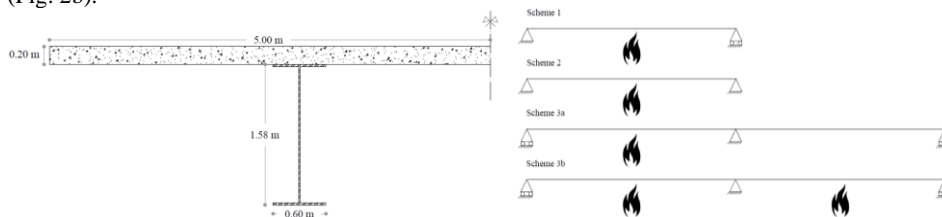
Bridge structural cross-section – 2b Static schemes for structural analysis
